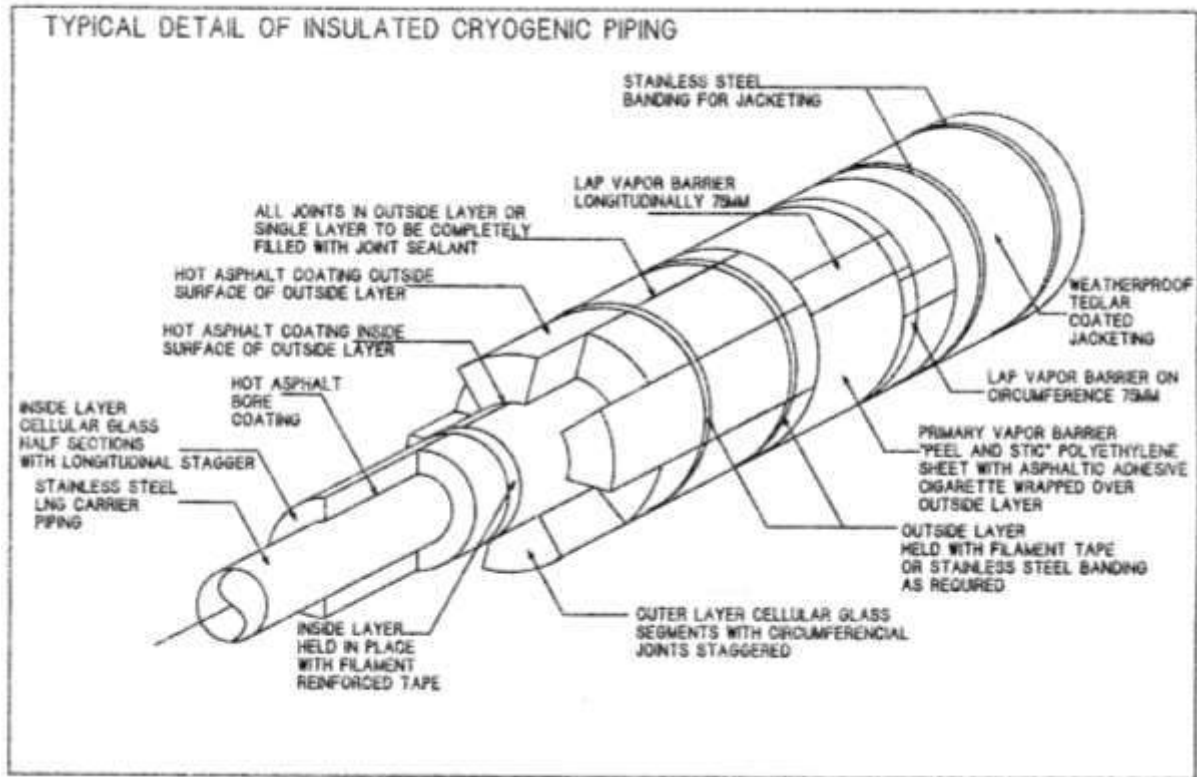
Typical Detail of Insulated Cryogenic Piping
